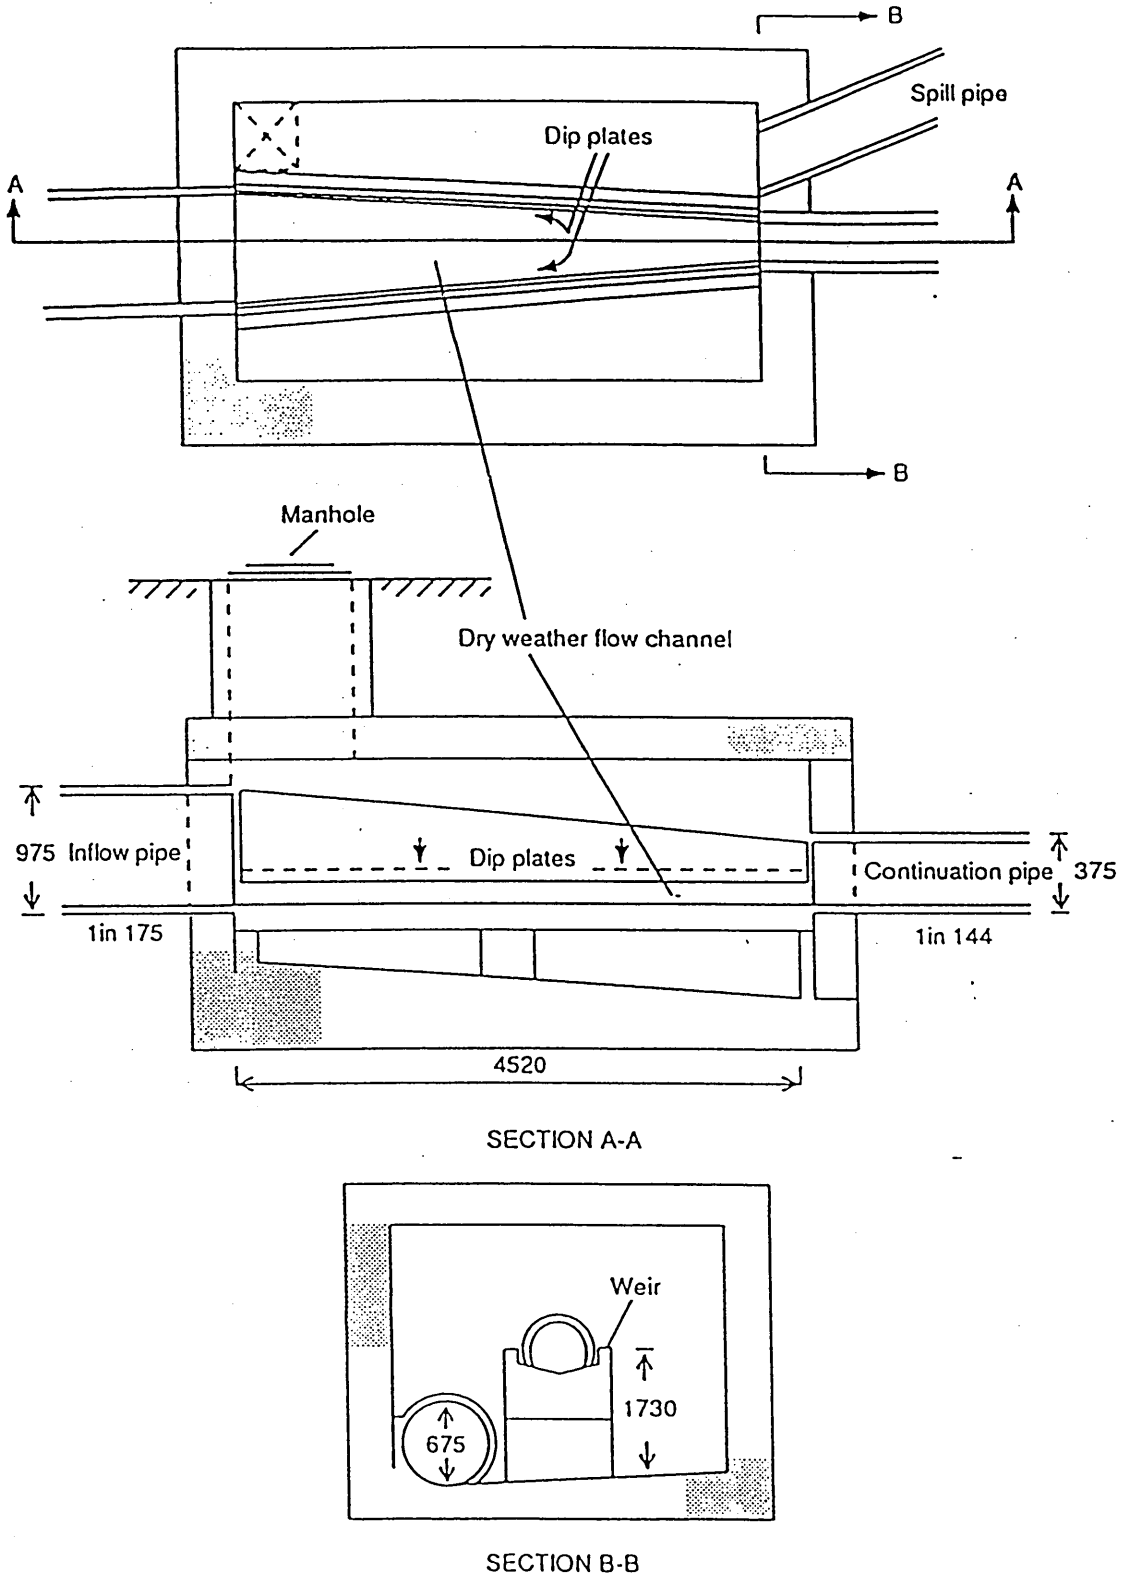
Plan and Cross-Section of the Low Side Weir Site (Retford Road)
